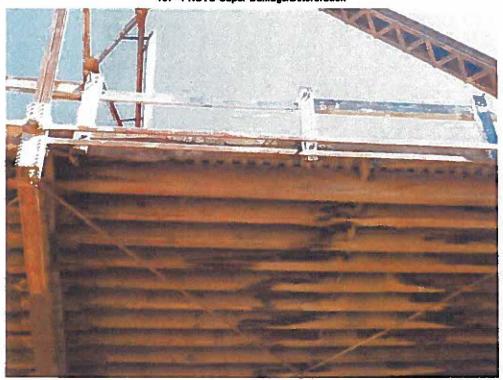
Damaged left exterior stringer near Abutment 1
